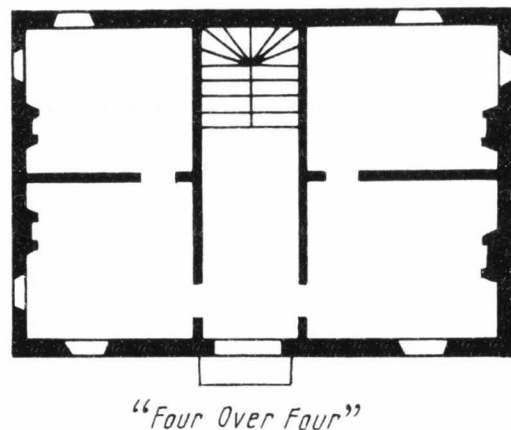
Floor plan of "Four over Four" house. (After Richard Francaviglia, *Mormon Central-Hall Houses*, 1971)
